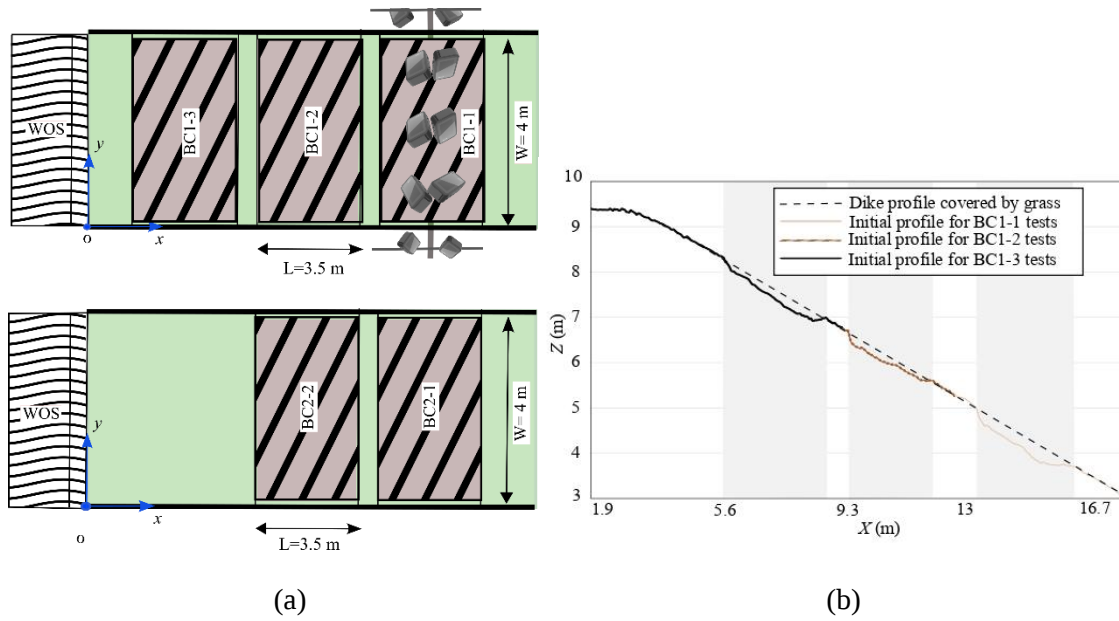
(a) BC test flumes and section layouts; and (b) initial and excavated levee slope profiles for all BC1 sections (obtained from photogrammetry).
